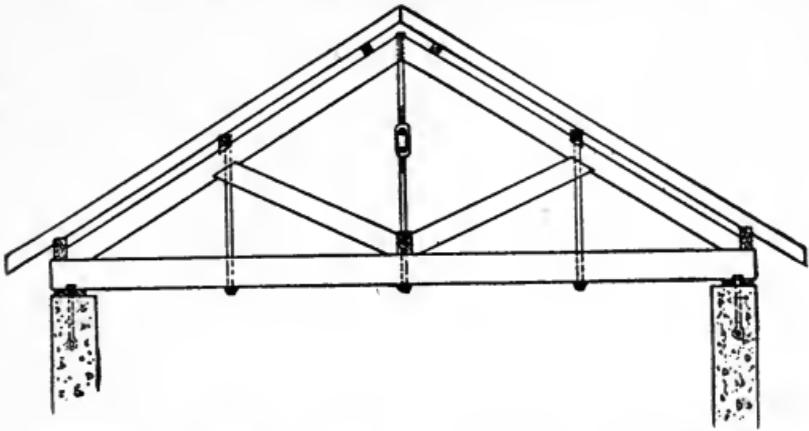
Design of Roof Truss Intended to Span a Farm Garage
